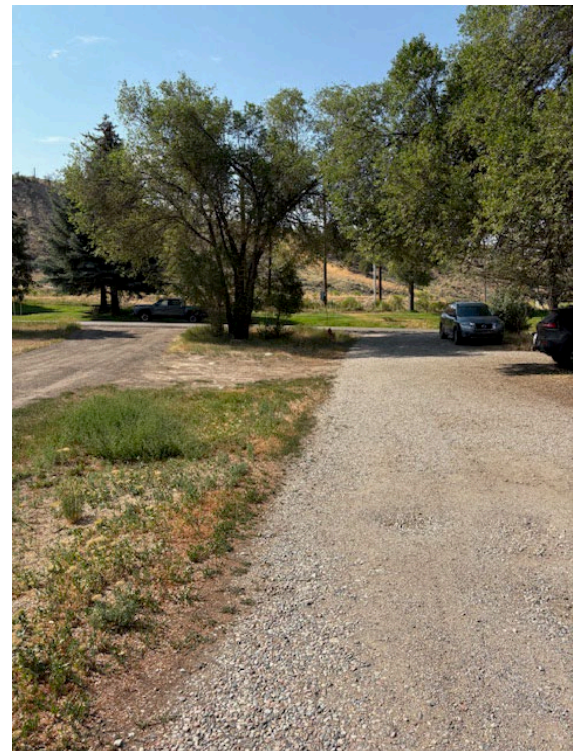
Existing private access drive at Kaibab Park Lot 18 (Looking South Toward Whiting Road).
